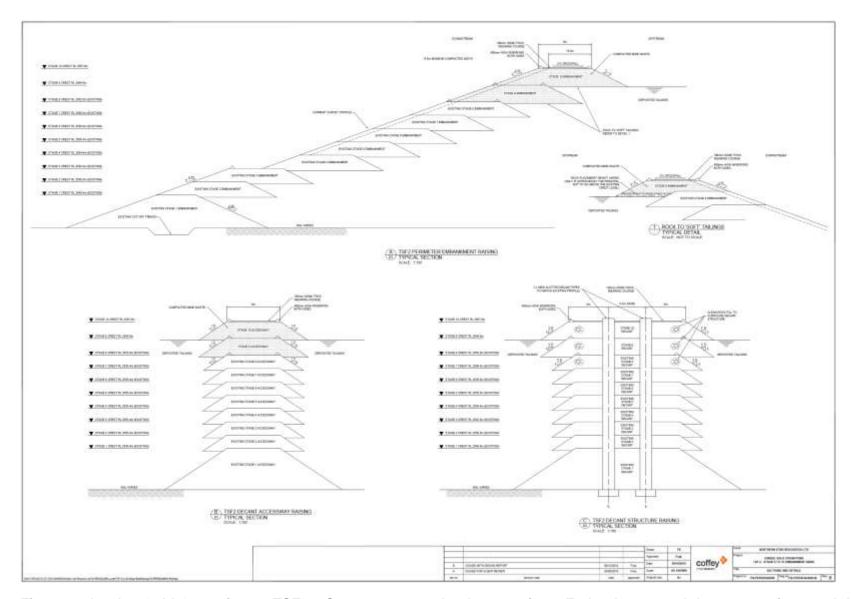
Jundee Gold Operations – TSF2 – Stage 9 to 10 embankment raise – Embankment and decant; sections and details
